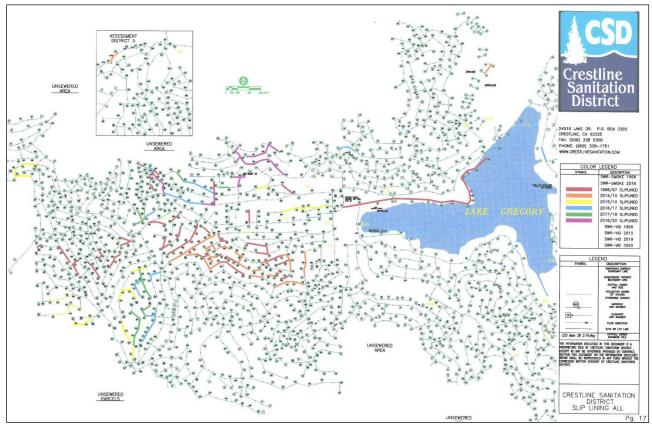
Crestline Sanitation Districts Service Area and Collection System Repairs to Date (FY19/20 in Pink)
